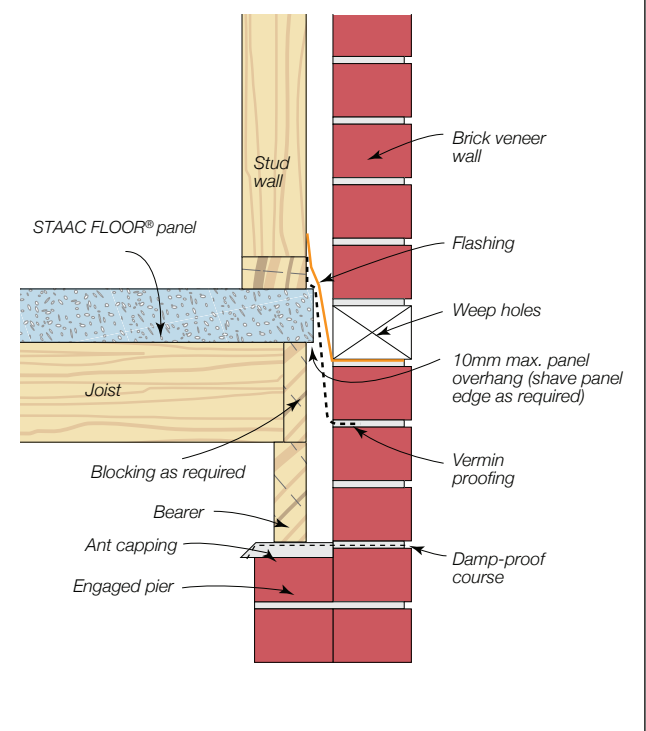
Edge Blocking Detail Between joints, with STAAC FLOOR® and STAAC WALL® Low Rise External Wall System
